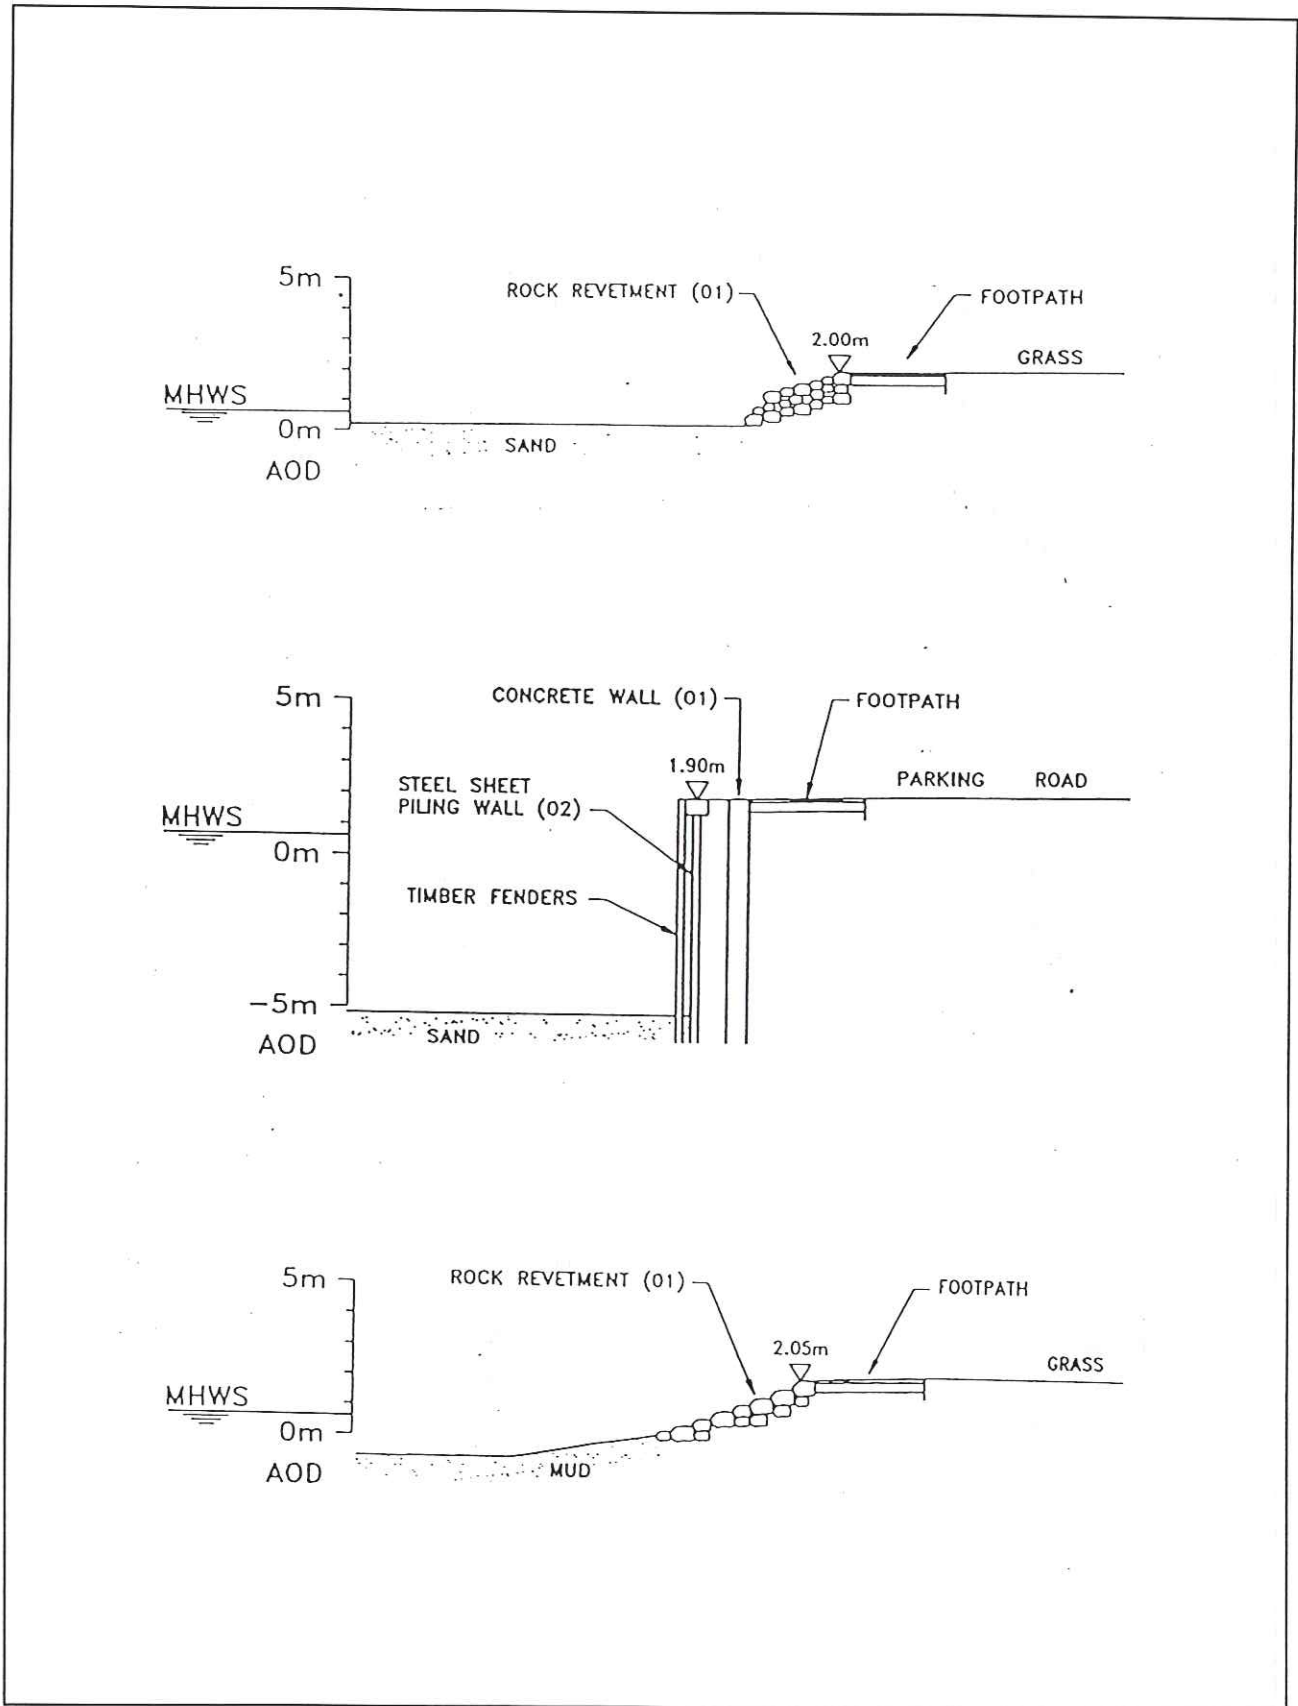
Seawall cross-sections 7/4, 8/2 and 9/2
